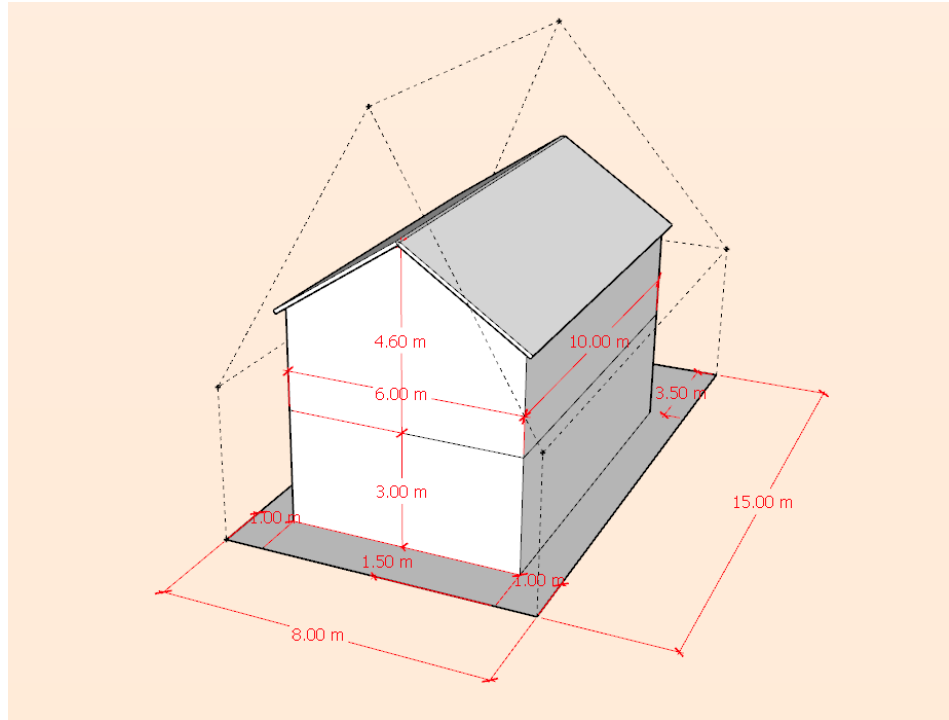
Modelled permitted building envelope within a flat 8m x 15m site. In this example it has been assumed no parking is provided.
